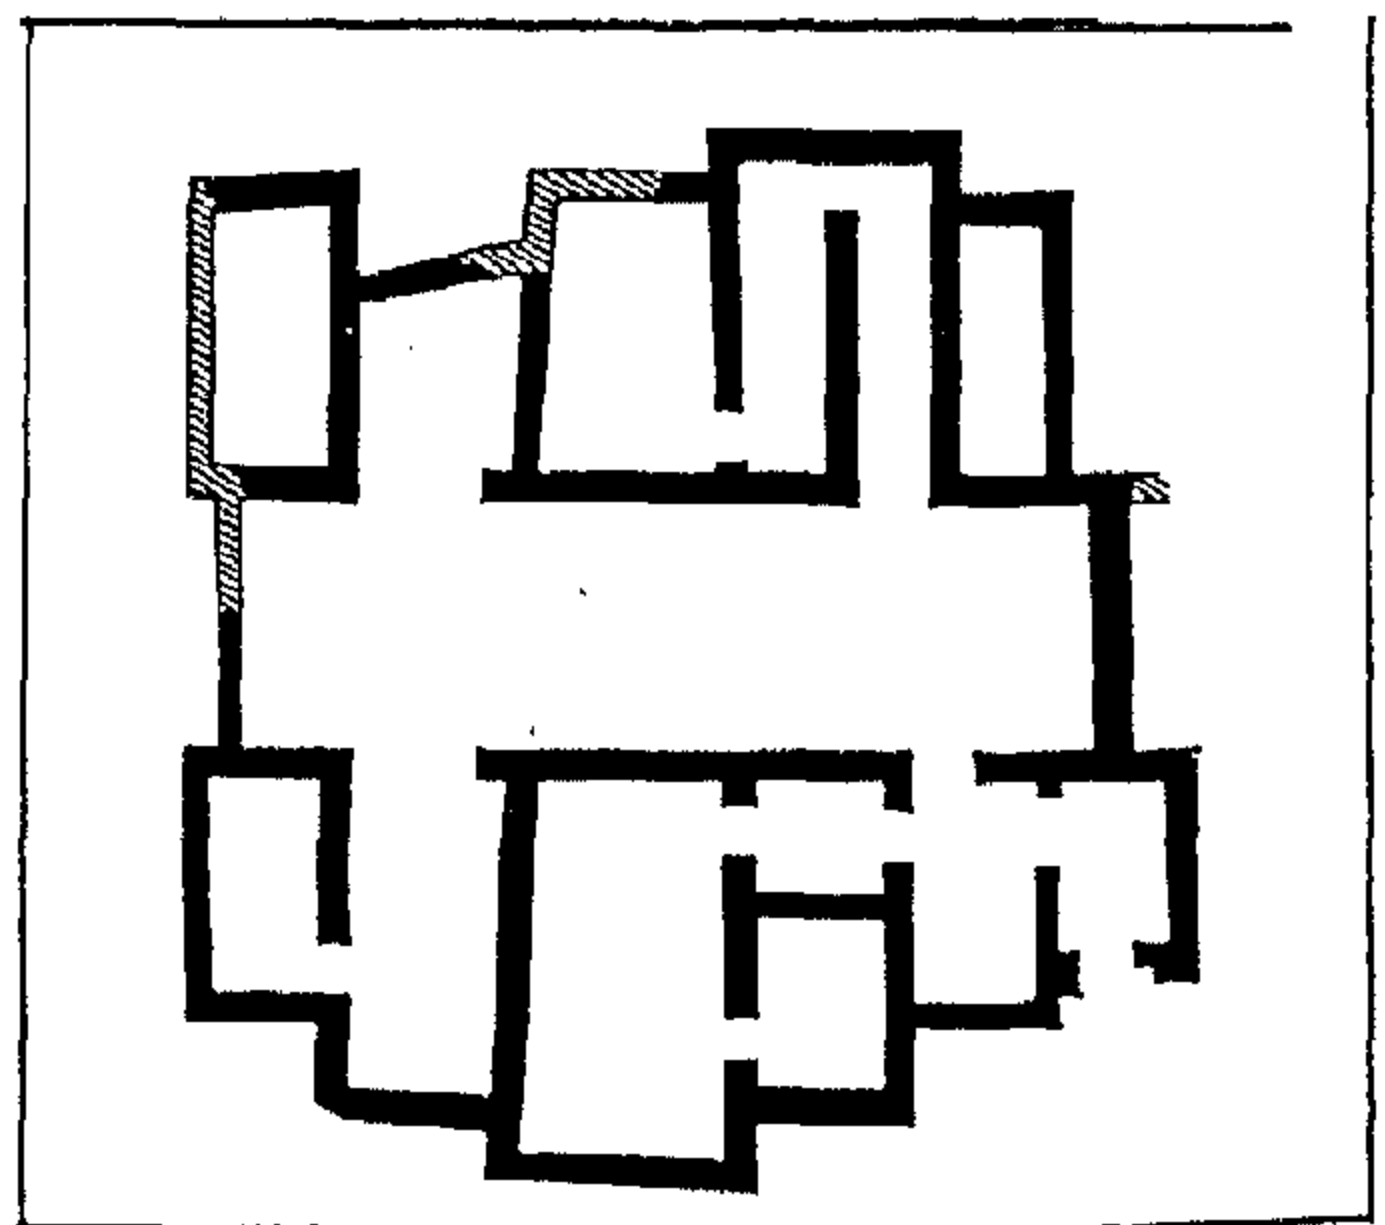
Plan of House in level XV at Tepe Gawra (after Tobler 1950, pl. XV).
